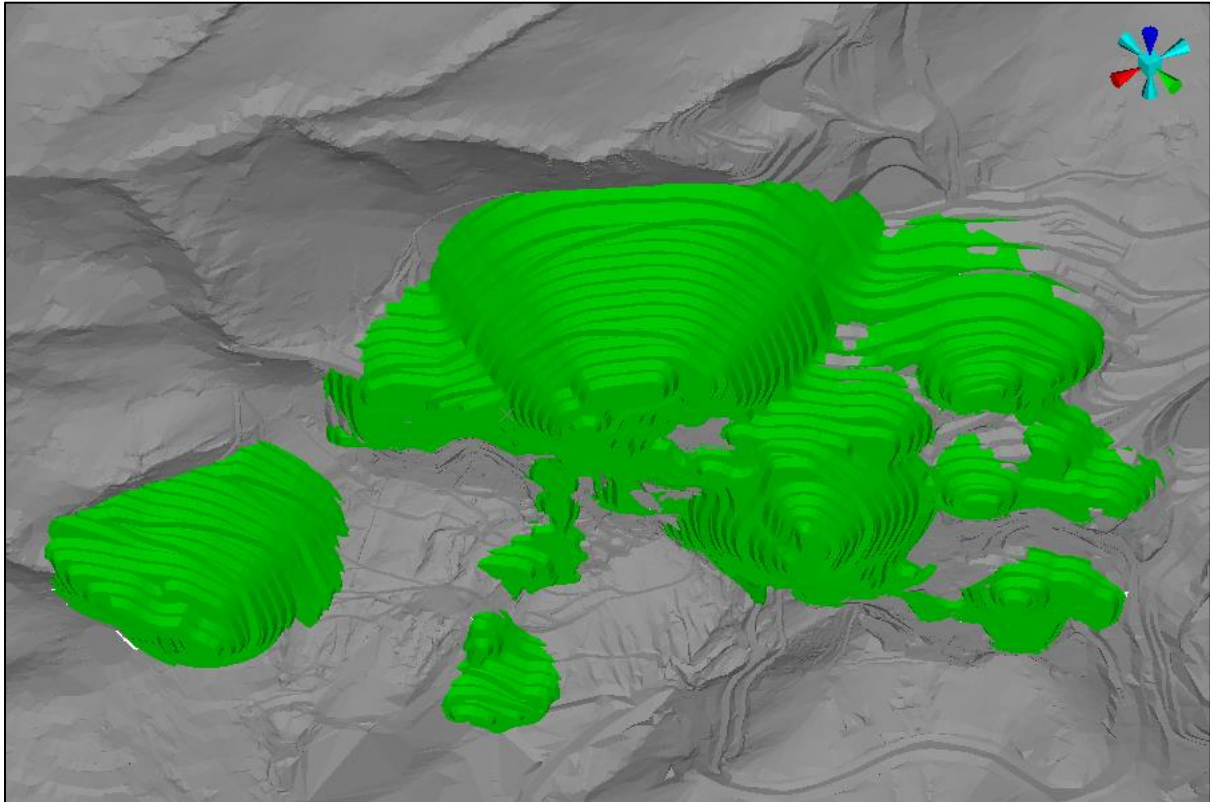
Gedabek pit design, orthogonal view looking towards the south west
